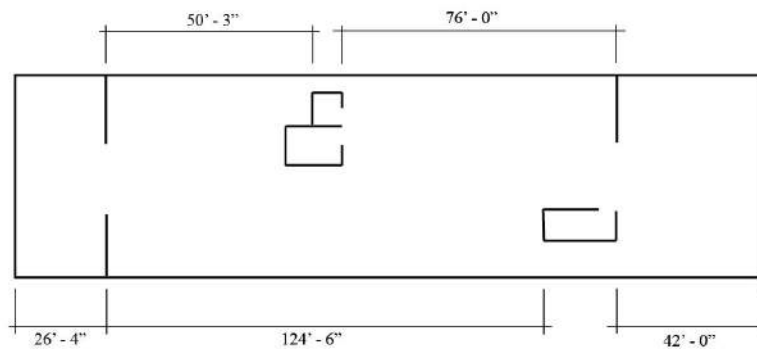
Assumed Floor Lengths for In-Plane Deflection Calculations
